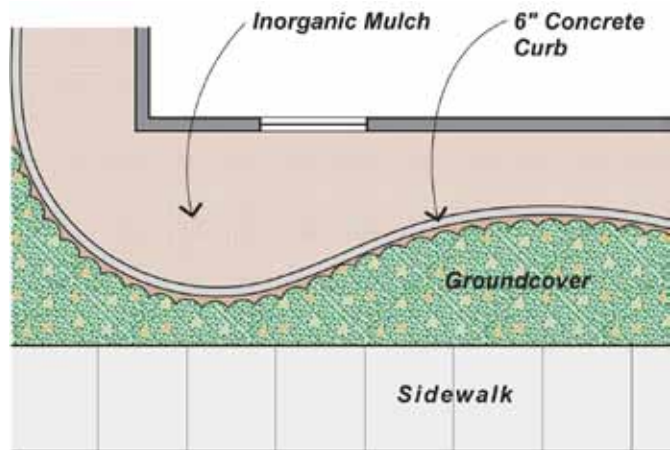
Typical landscape concept to replace turf areas. Detail is used between planting and inorganic mulch areas.
